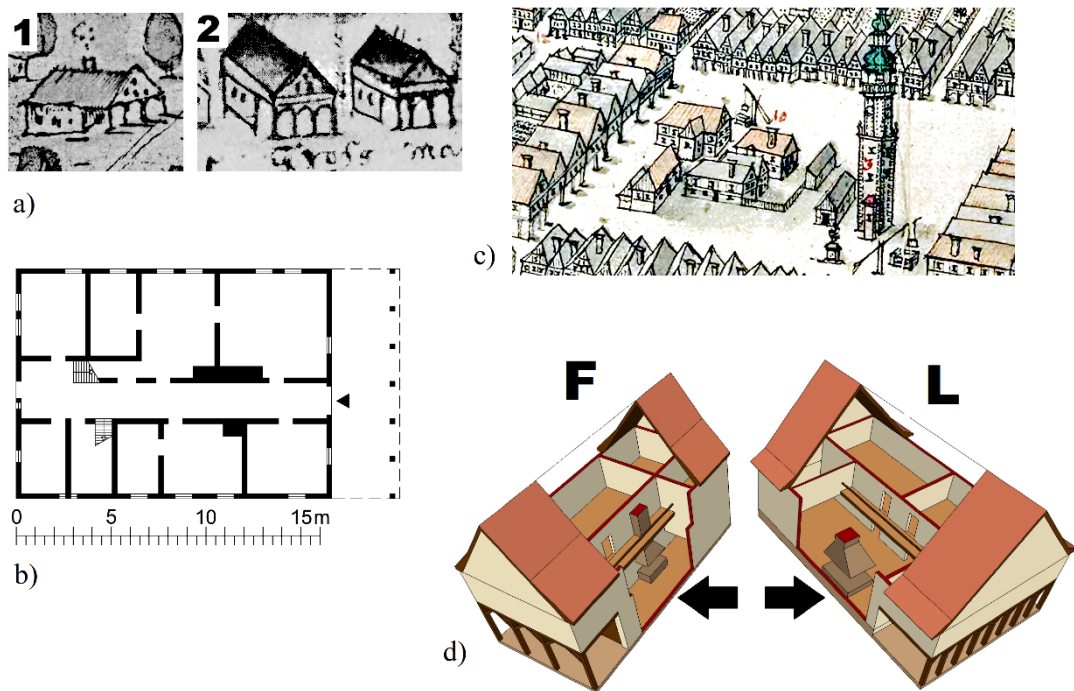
a) I-type houses: 1 – a one-story house by Gdańsk, ca 1650 (detail of unidentified plan from authors' collection); 2 – two story houses in Myszewo (Germ. Mausdorf), 1647 (Kloeppel, 1924). b) Lüdersdorf, Stegmann's House, plan (after Kulke 1939). The three-section structure of the interior is visible. c) Kąty Wrocławskie (Canth), Lower Silesia, detail. Half-timbered and wooden burgher houses (Wernher, Pars IV, ca 1750). d) Comparison of analogous house structures: F – Friedland, house Markt 16 (after Witt 1932); L – Lipce by Gdańsk. The arrows point to high halls with open hearths.
